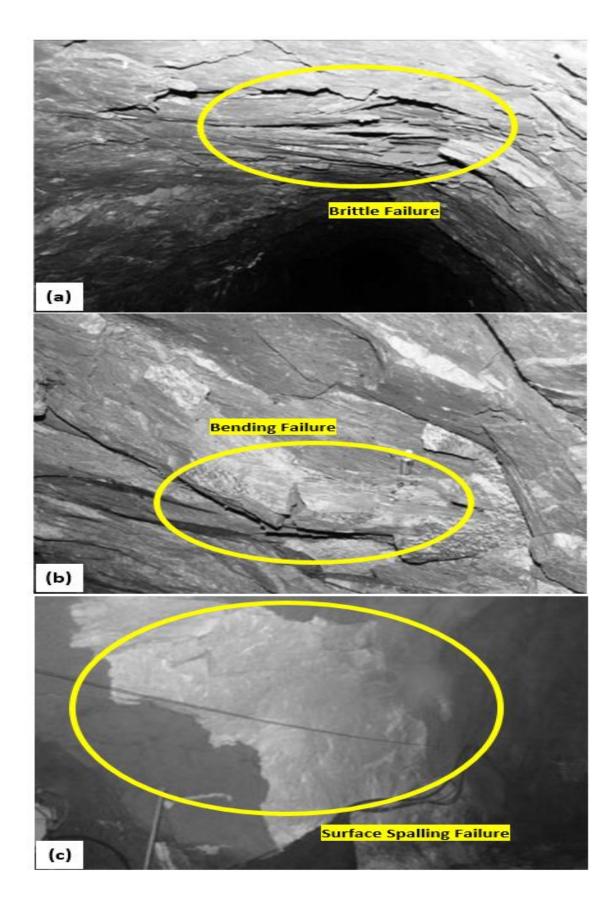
Typical failure modes derived from induces stress/seismicity in deep underground mines; (a) Brittle failure in high stress, (b) Bending failure in high stress, (c) surface spalling failure in high stress and seismic events
